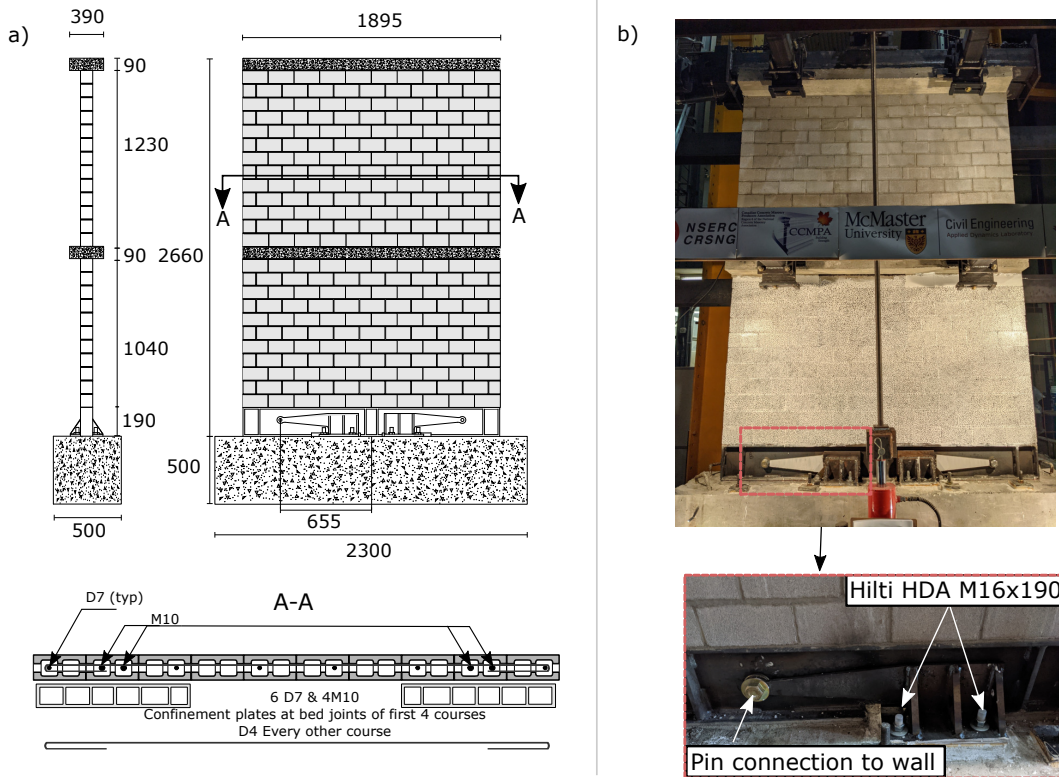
a) Typical wall geometry (all dimensions are in mm); and b) Photo of a wall prior to testing, with details of the energy dissipation installation
